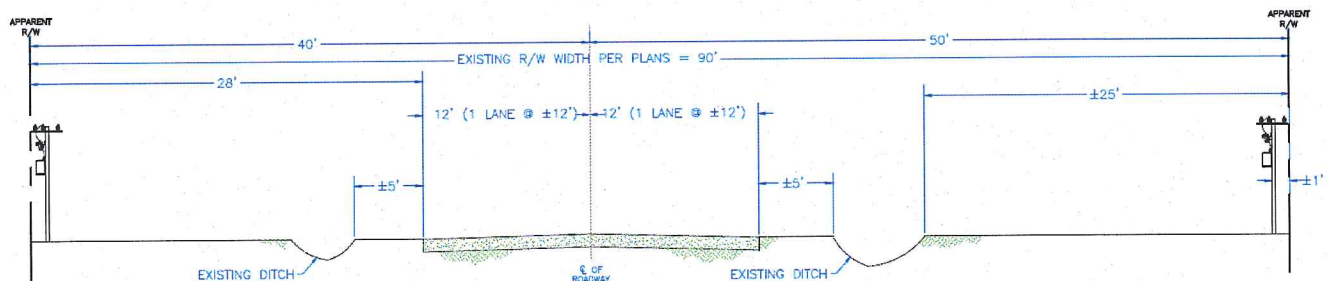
LA 1040 – Klein Drive to Old Baton Rouge Highway – Existing Typical Section Facing East
